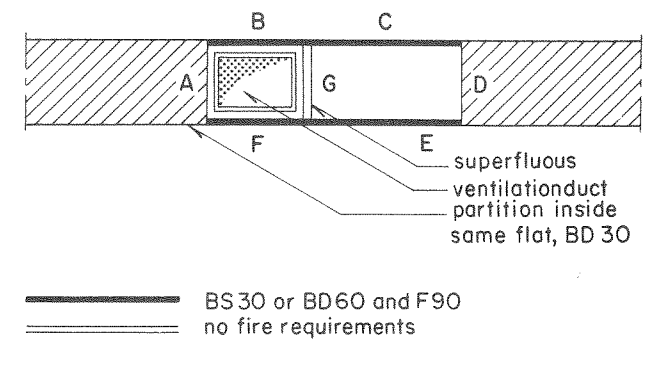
Pipe space service unit inside same flat; fire requirements at multistorey dwelling houses
